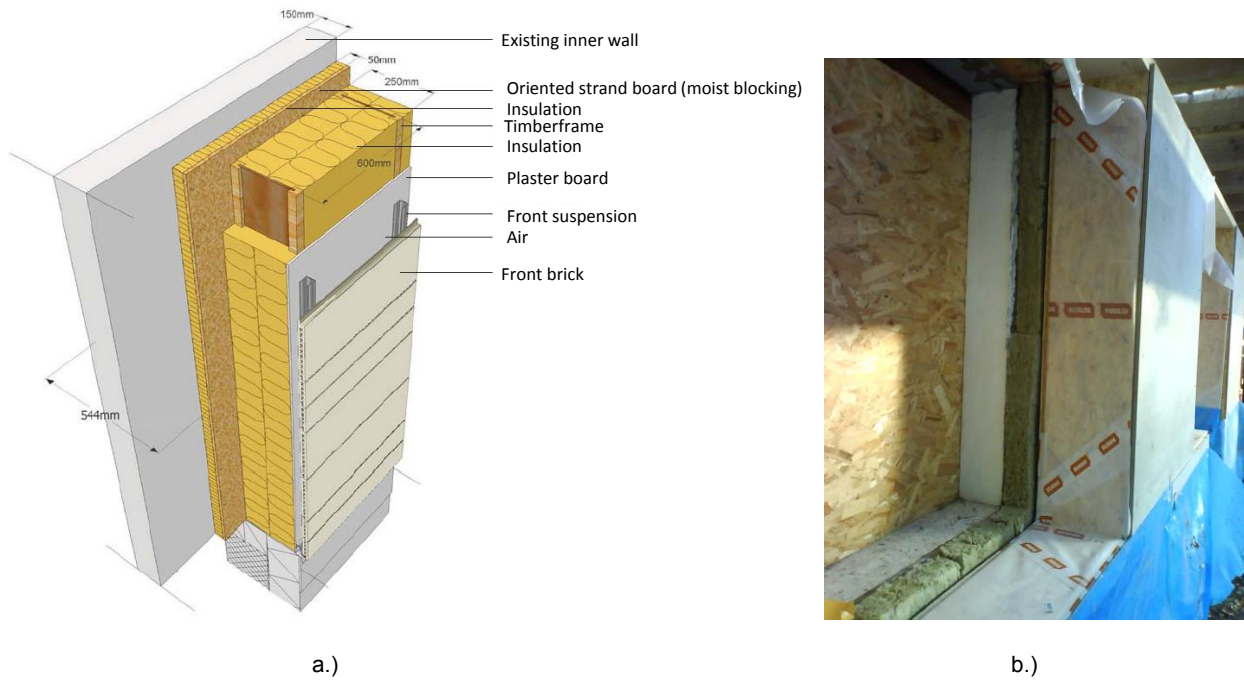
a.) Cross section of the façade elements. b.) Element mounted to the existing inner wall.
